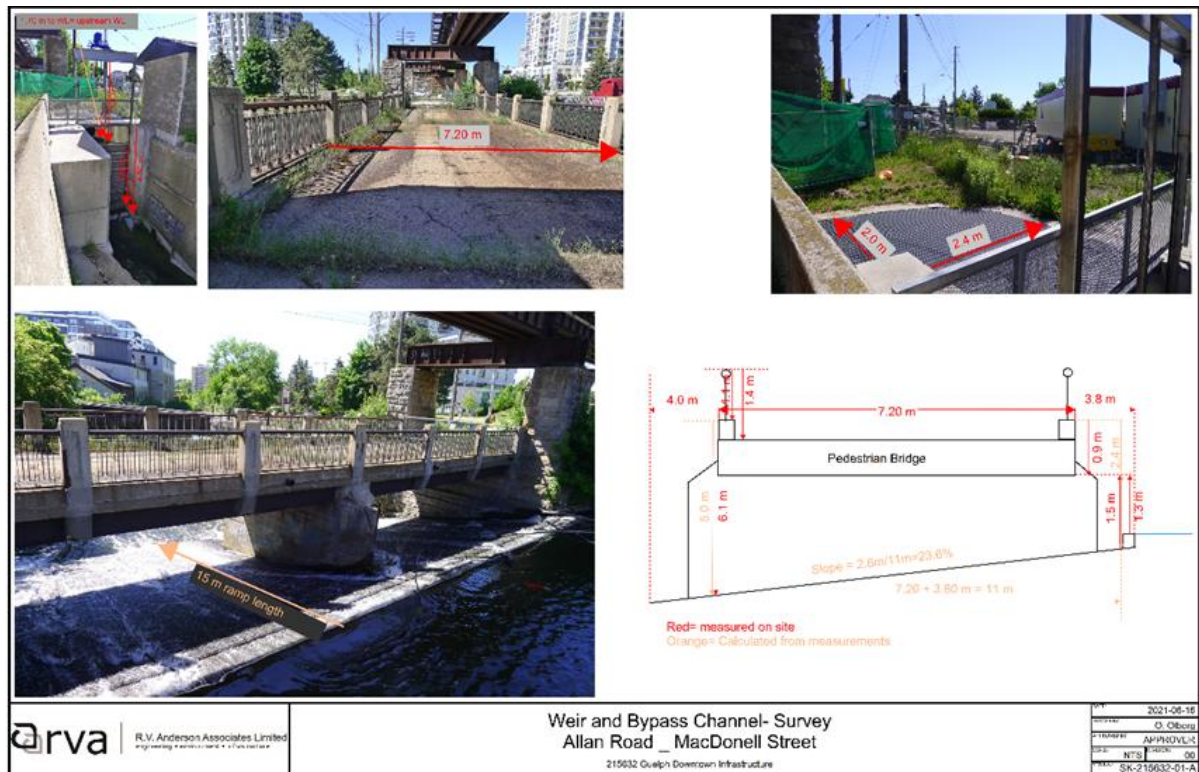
Allan's Dam Bridge and Sluiceway Field Measurements
